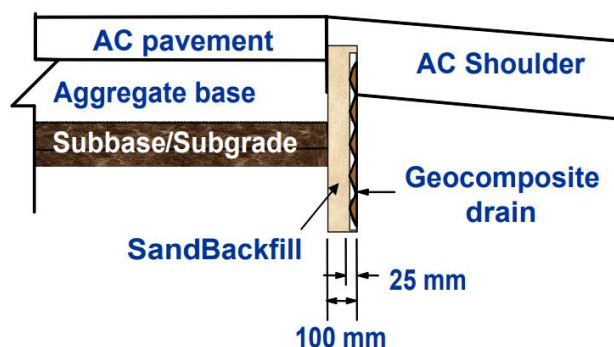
Typical AC pavement with geocomposite edgedrains
